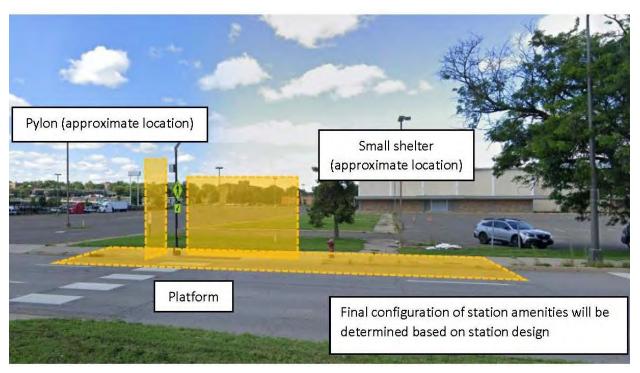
Rice Street and Fuller Avenue proposed southbound platform on the west side of Rice Street adjacent to the Sears Retail Store and Auto Center.
